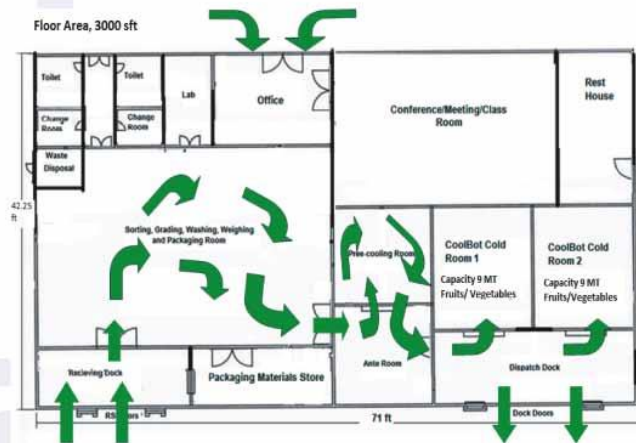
Floor plan of small scale multipurpose short-term/transit cold storage (MPCS)
